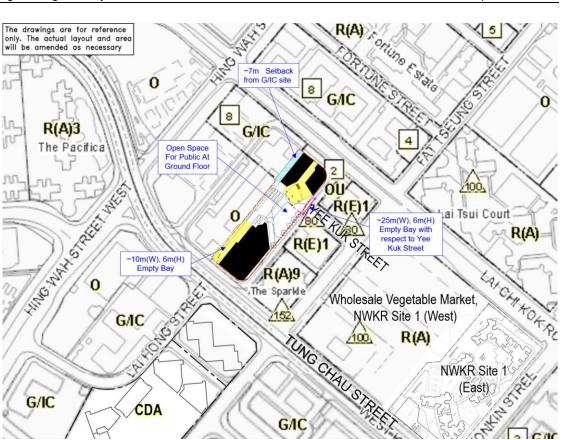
Proposed Scheme – Ground Floor Layout (Podium Block)
